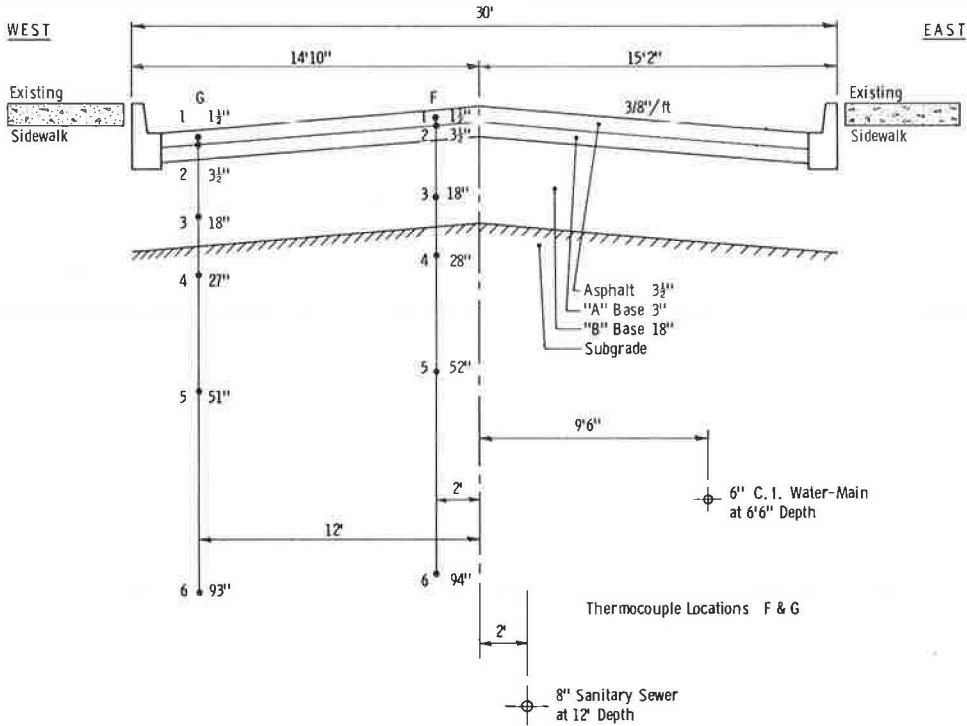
Pavement design and thermocouple locations of control section at Station 6+10, Antwerp Street.
